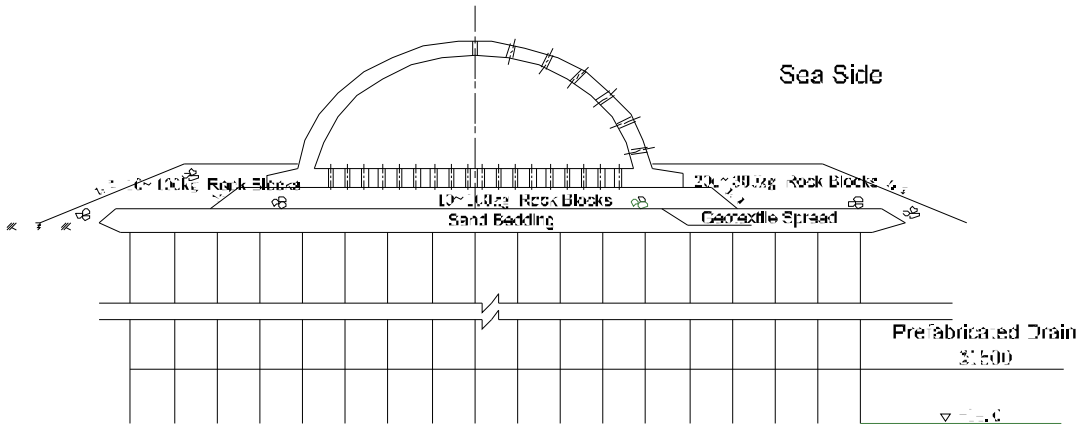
Typical Cross Section of East and South External Extensions of North Grand Breakwater for Tianjin Port
